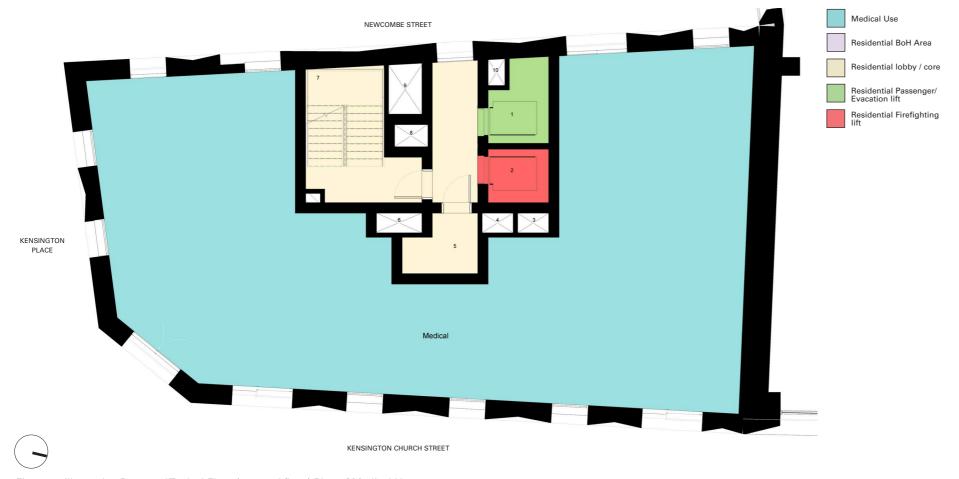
Illustrative Proposed Typical Floor (1st - 3rd floor) Plan of Medical Use
